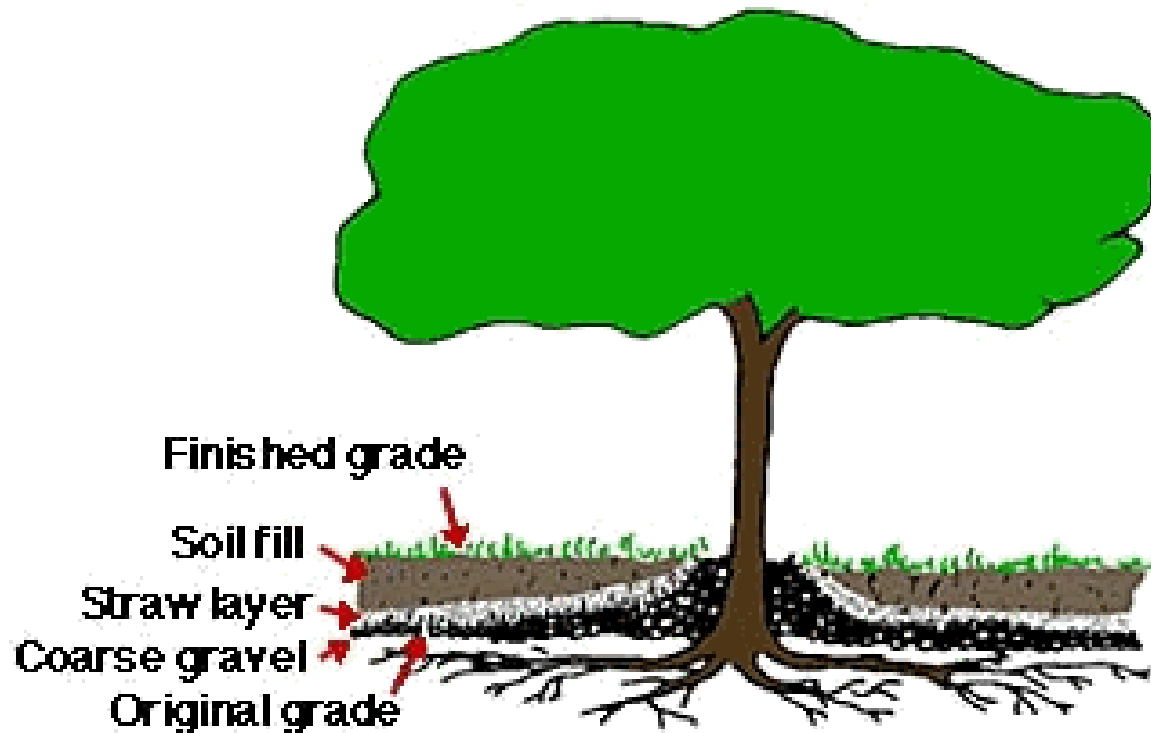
Coarse gravel placed over the original grade will provide aeration for tree roots beneath shallow soil fill...
